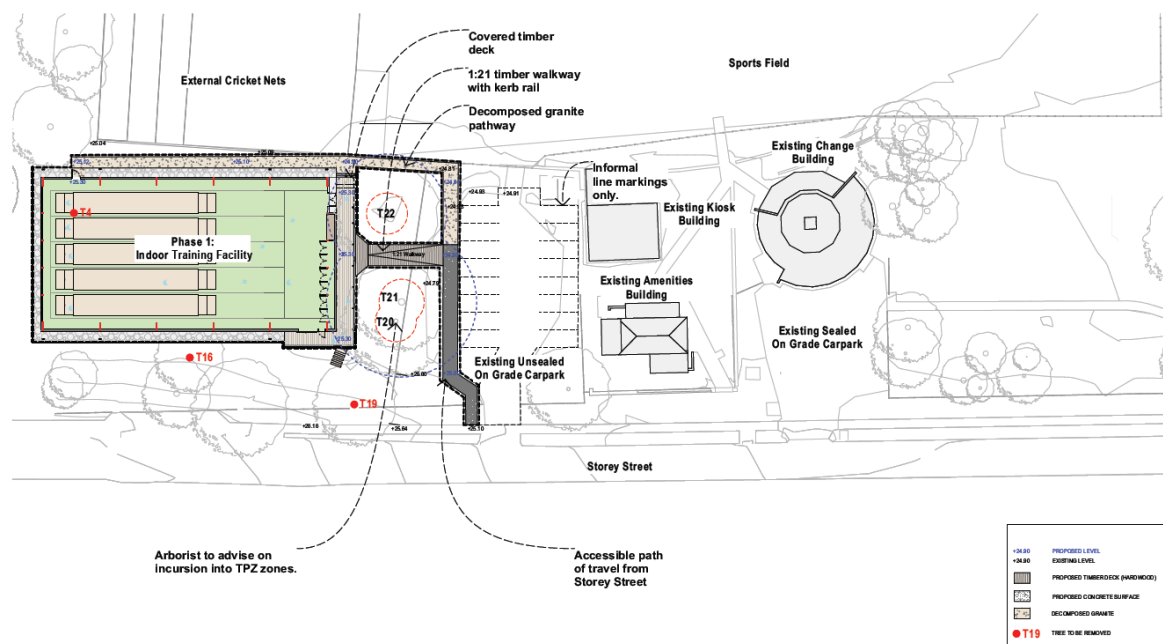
Snape Park Stage 1 – Indoor Training Facility.
